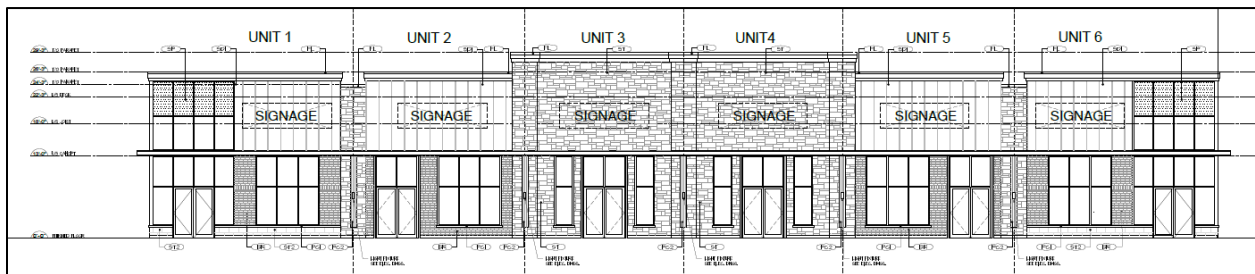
West Elevation of Commercial Buildings (July 2023)
